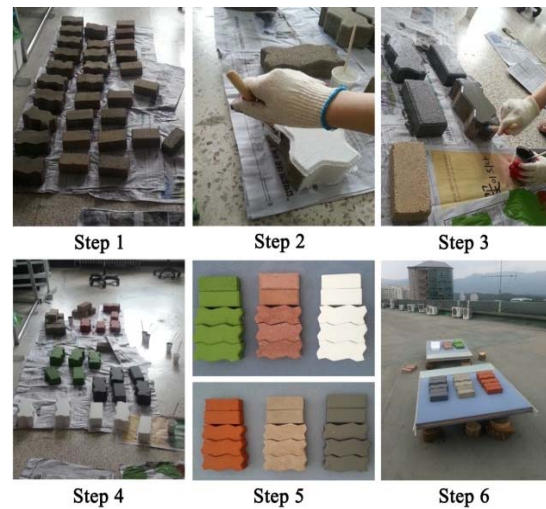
Coloring and arrangement of concrete bricks to measure T_s .
